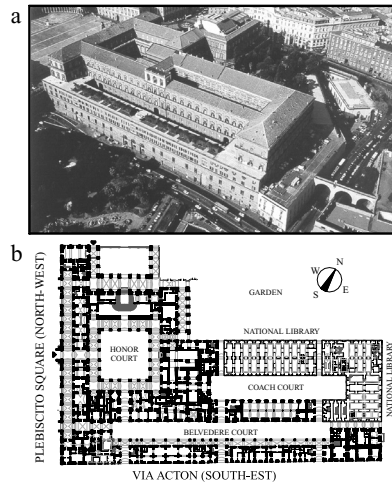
The Royal Palace of Naples: a) Bird's eye view; b) General layout at ground floor.
